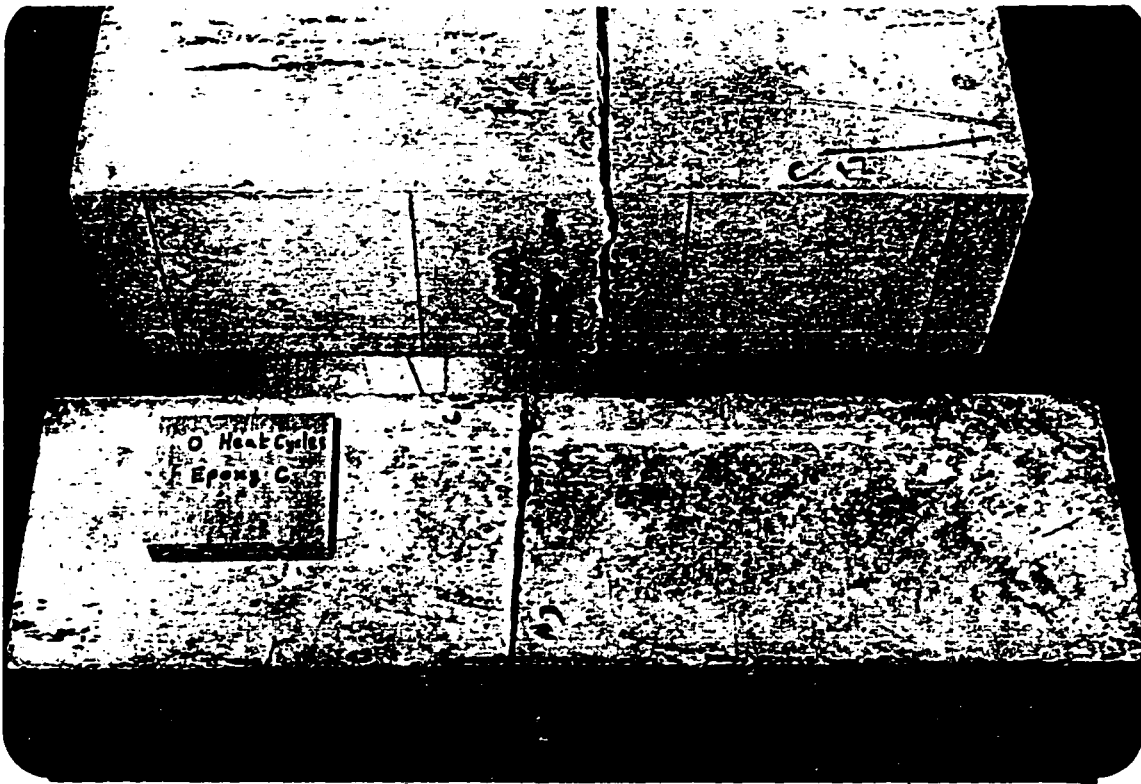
Repaired beams with epoxy C tested after 0 H/C cycles with a mode of failure in concrete away from the repair section.
